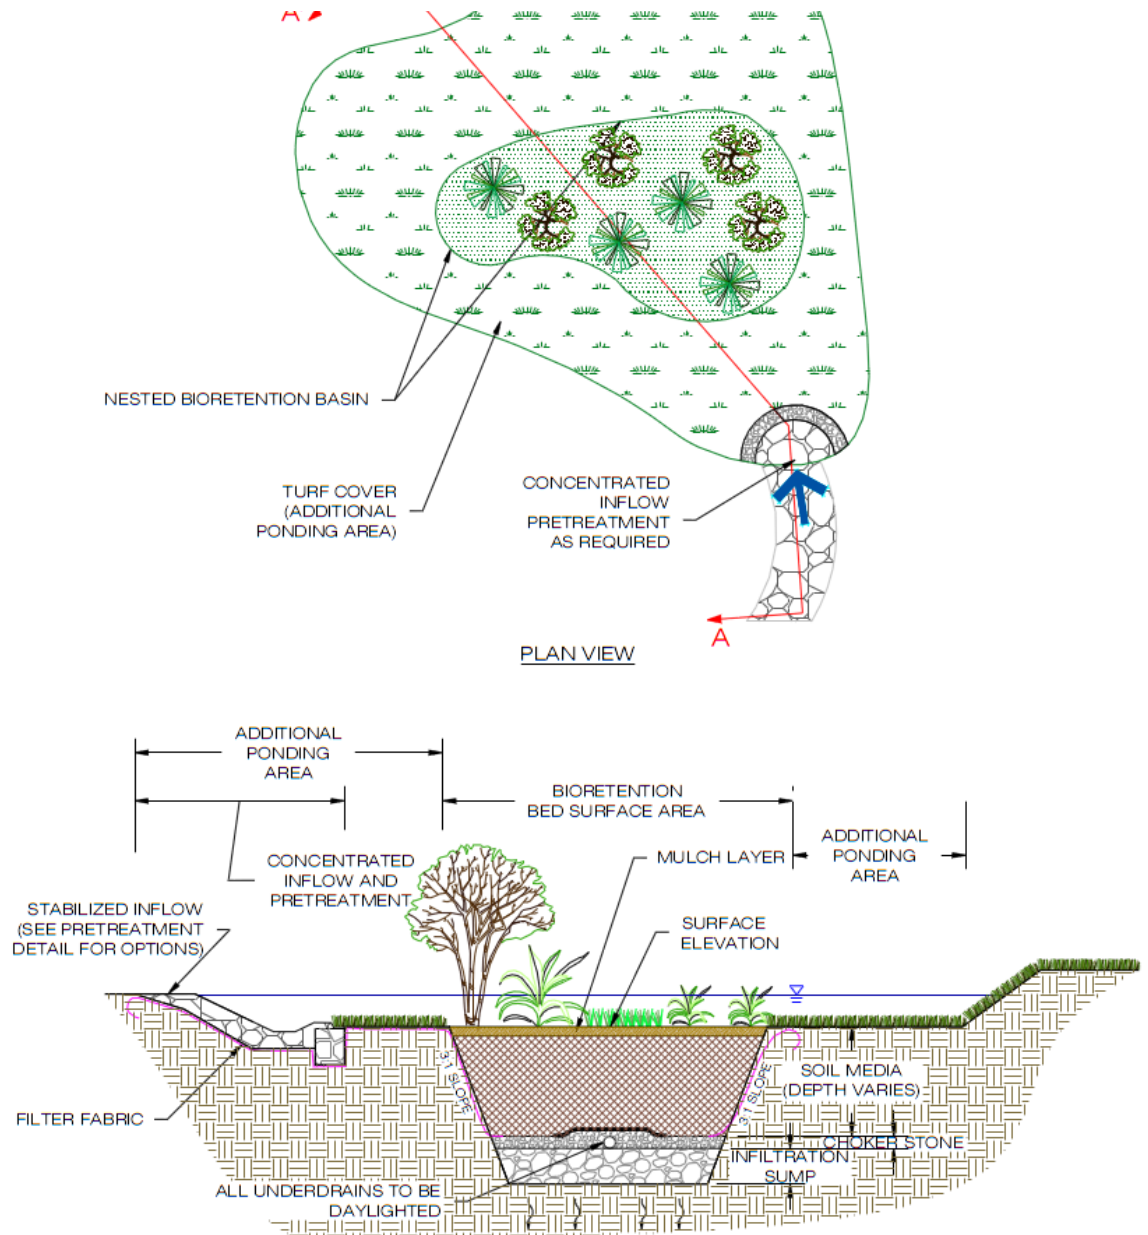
Typical Detail of Bioretention with Additional Surface Ponding
